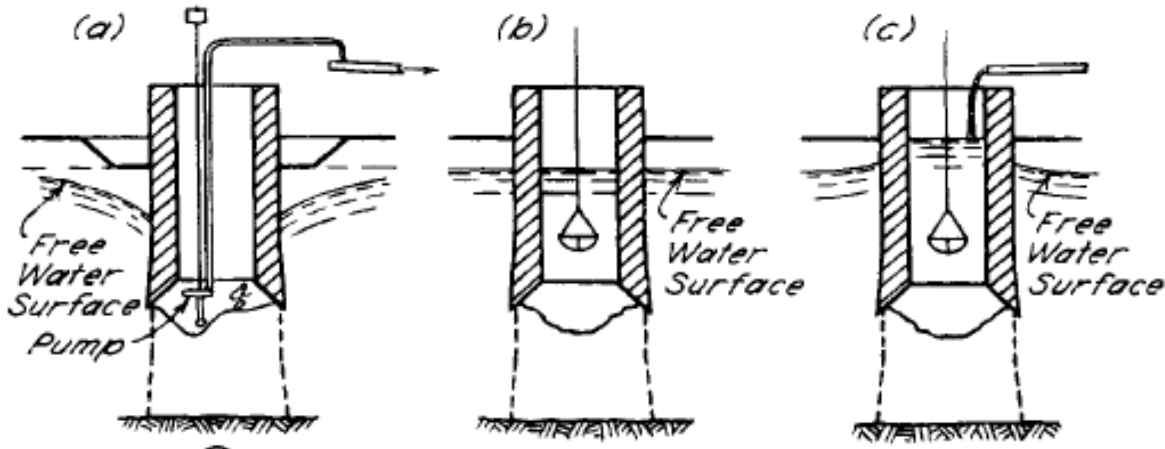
Open Caisson (Terzaghi, Peck et al. 1996)
